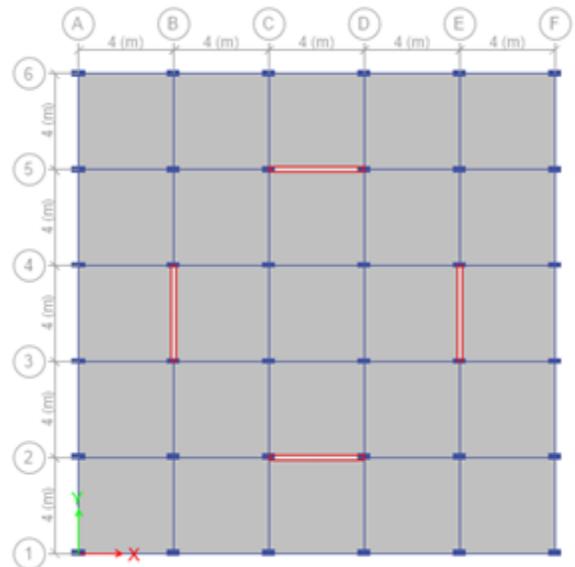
Plan of shear wall at mid span of 2nd grid
